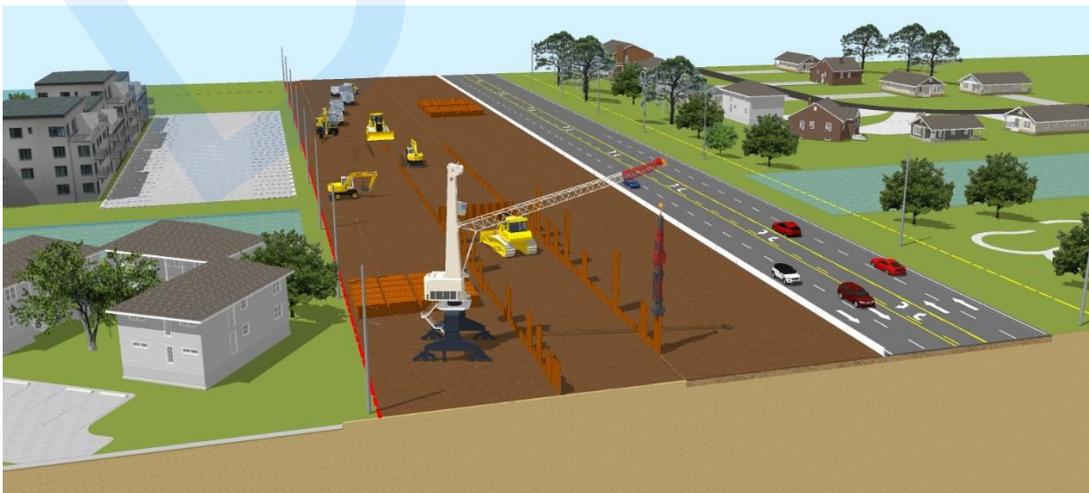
Phase 1 – Construct Temporary Lanes
